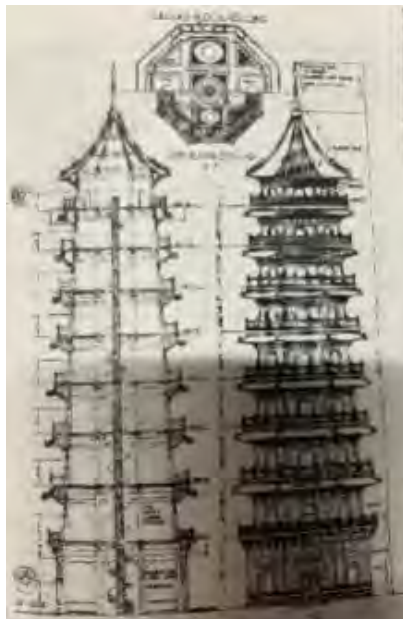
Section, elevation, and ground floor ceiling plan of the Pagoda-Tower at Linggusi. Designed by Henry Murphy and Doon Dayu.
